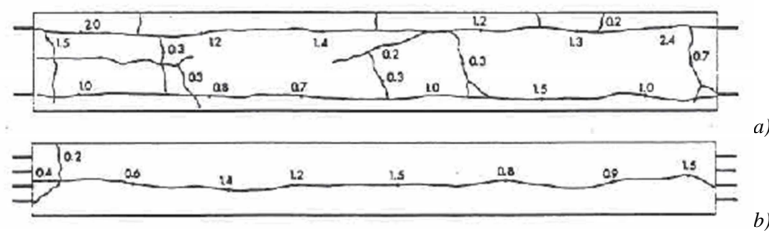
Cracks formation due to reinforcement corrosion: a) Longitudinal beam section; b) Bottom beam side, Rodriguez et al.[221]
